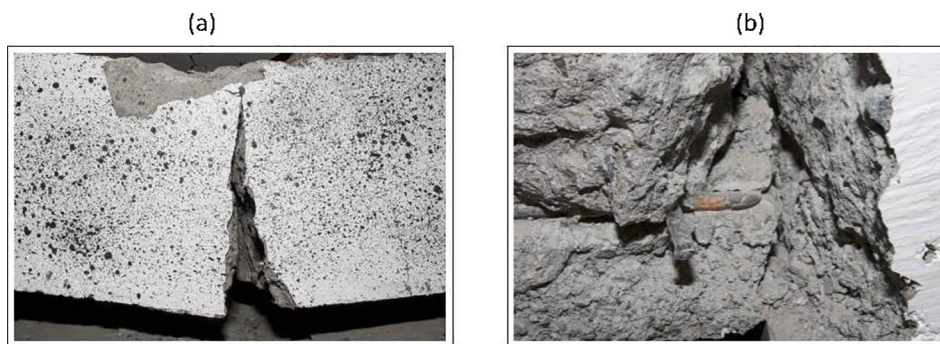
Failure mode of specimens B1 and B2 – (a) concrete cracking and (b) fracture of inferior steel welded mesh.
